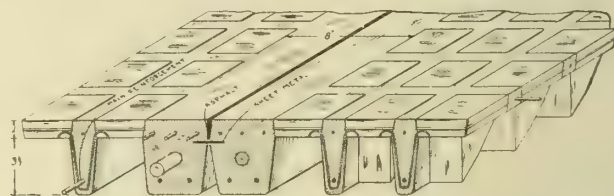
CROSS-SECTION OF SIDEWALK LIGHTS, SHOWING EXPANSION JOINT
